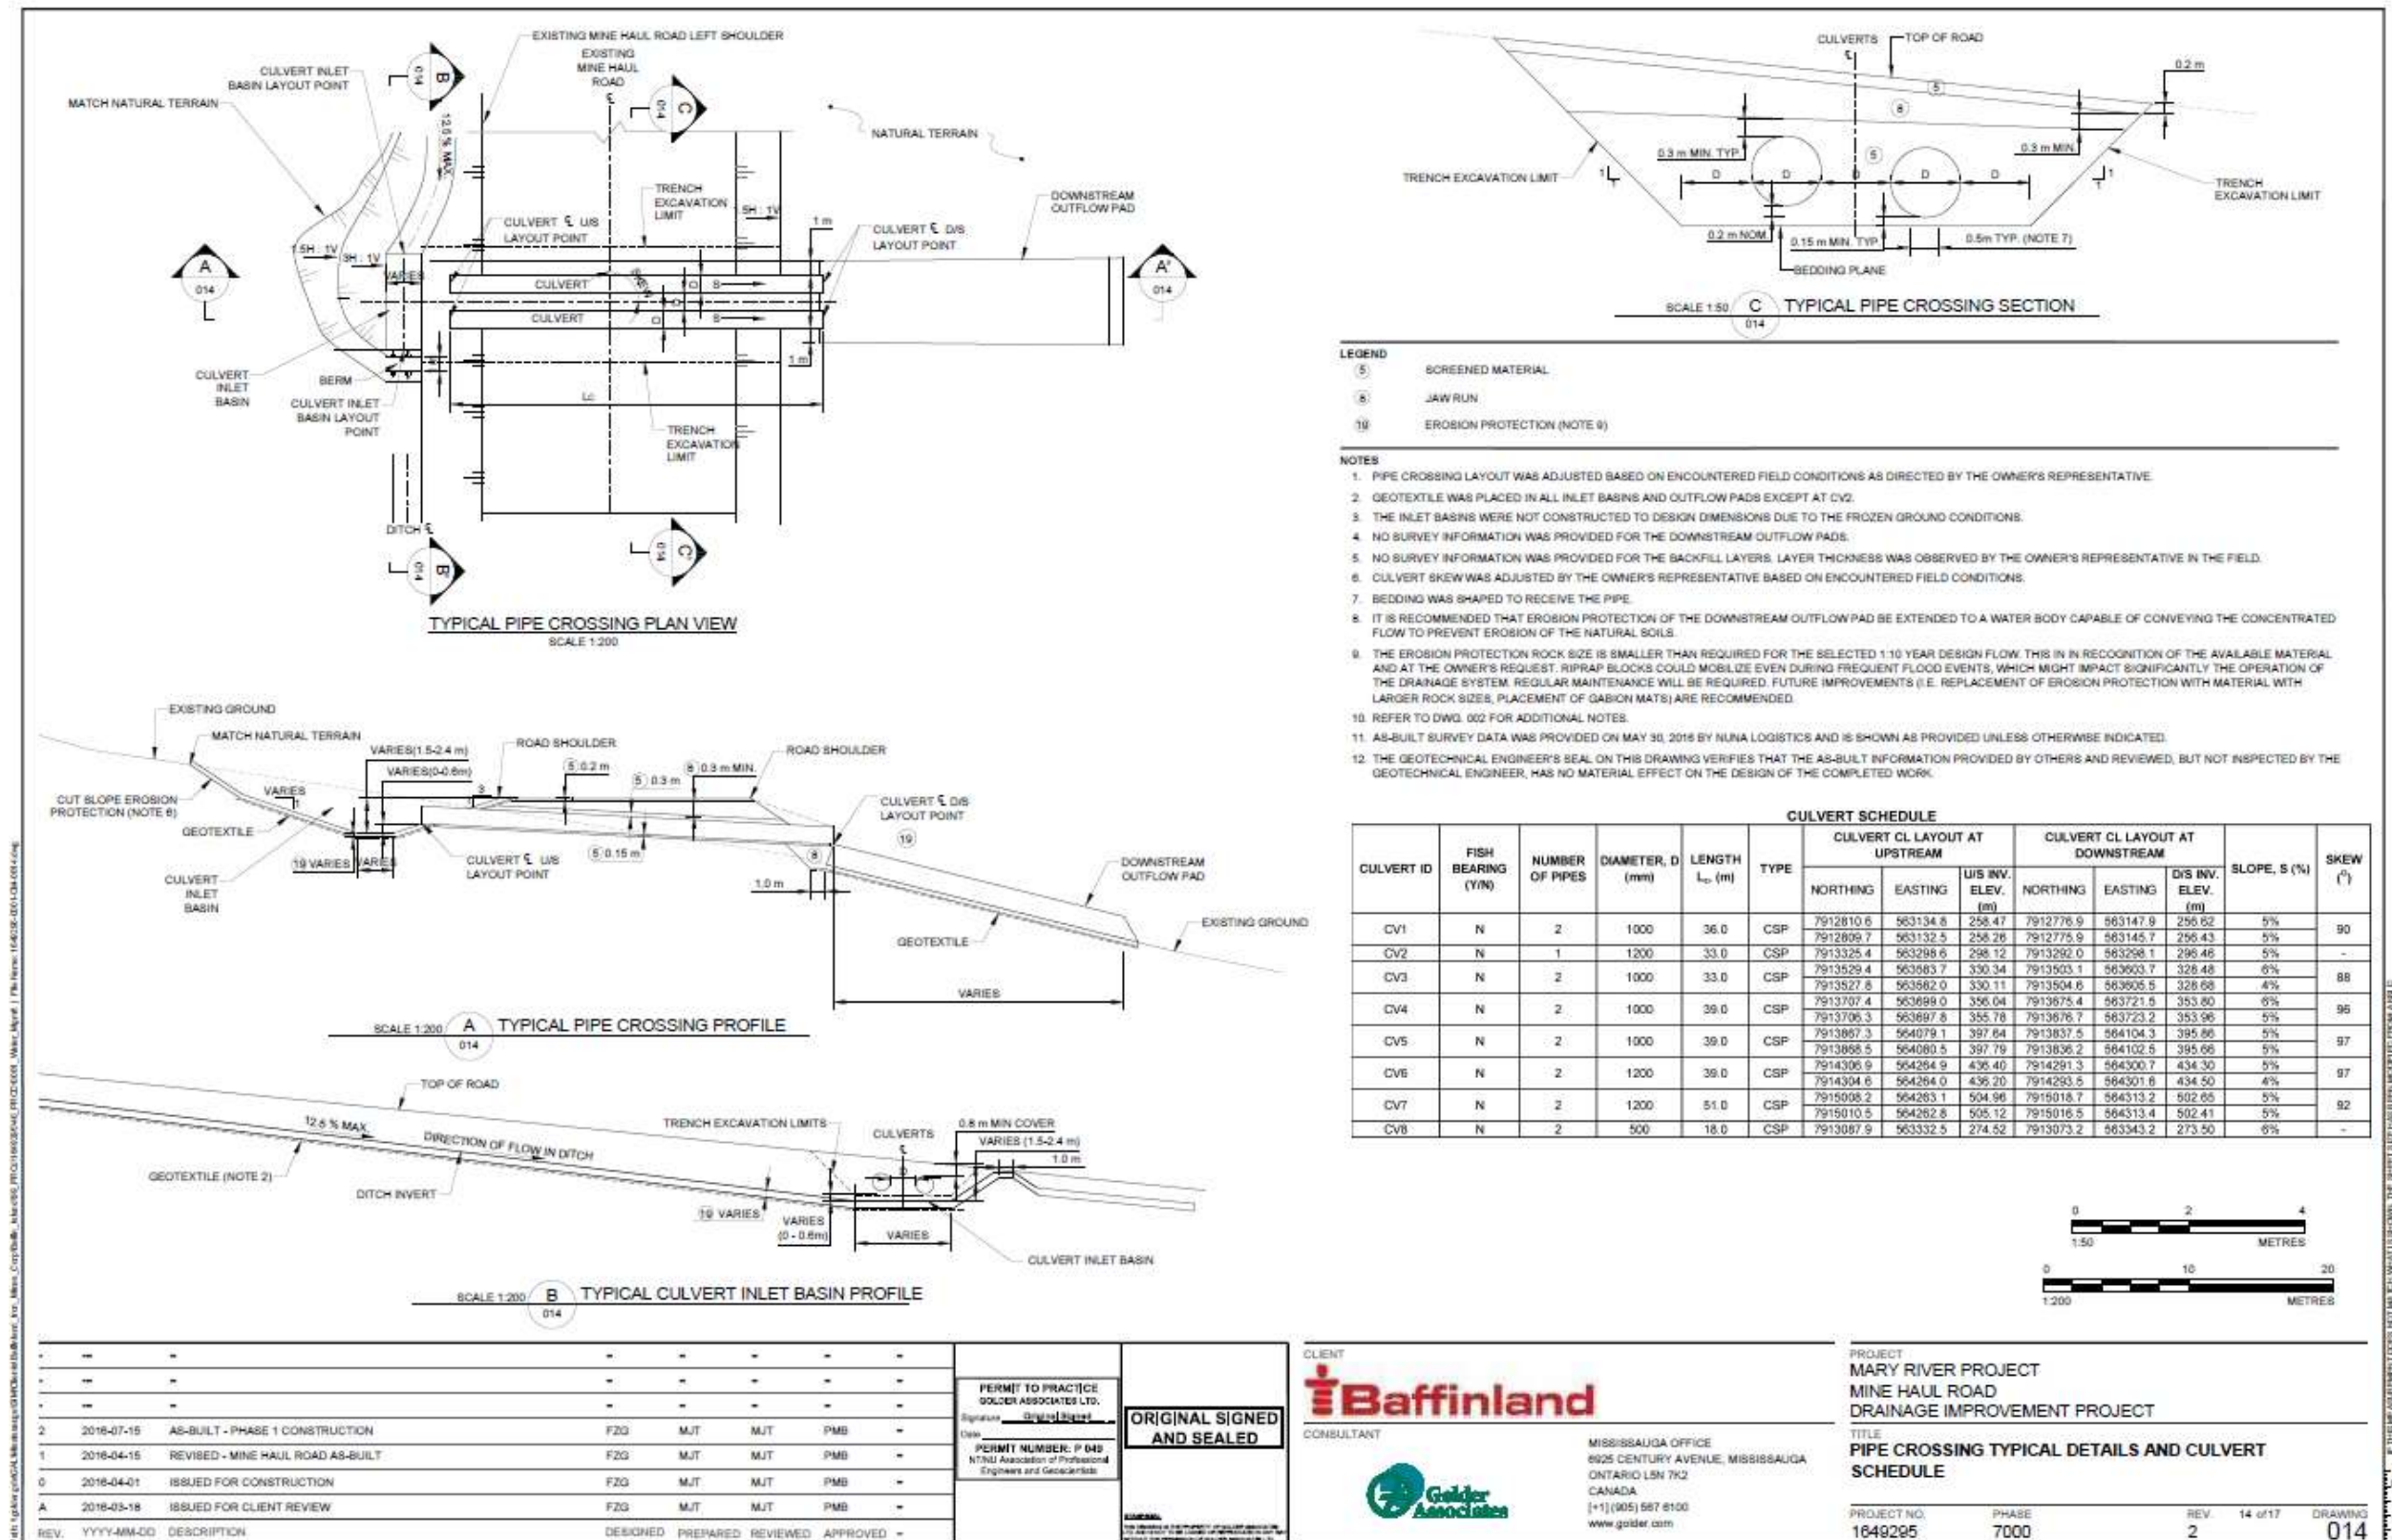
Typical Pipe Crossing and Culvert Details (from Golder, 2016)
